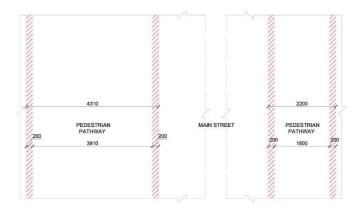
Street width and buffer spaces (in mm) for Gateway 4 in the area surrounding Frankfurt am Main Hauptbahnhof
